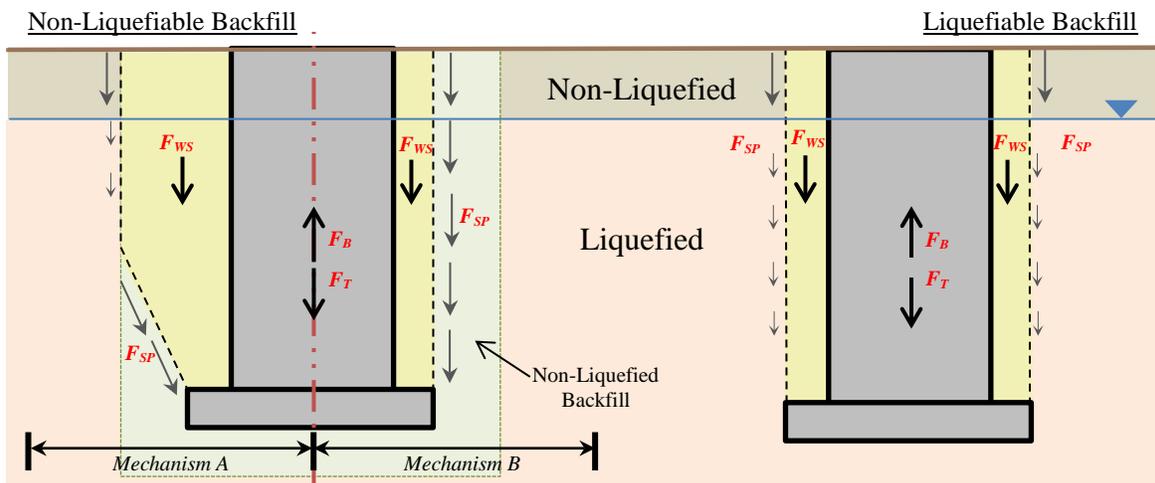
Schematic of typical failure mechanisms for liquefied and non-liquefied backfill
